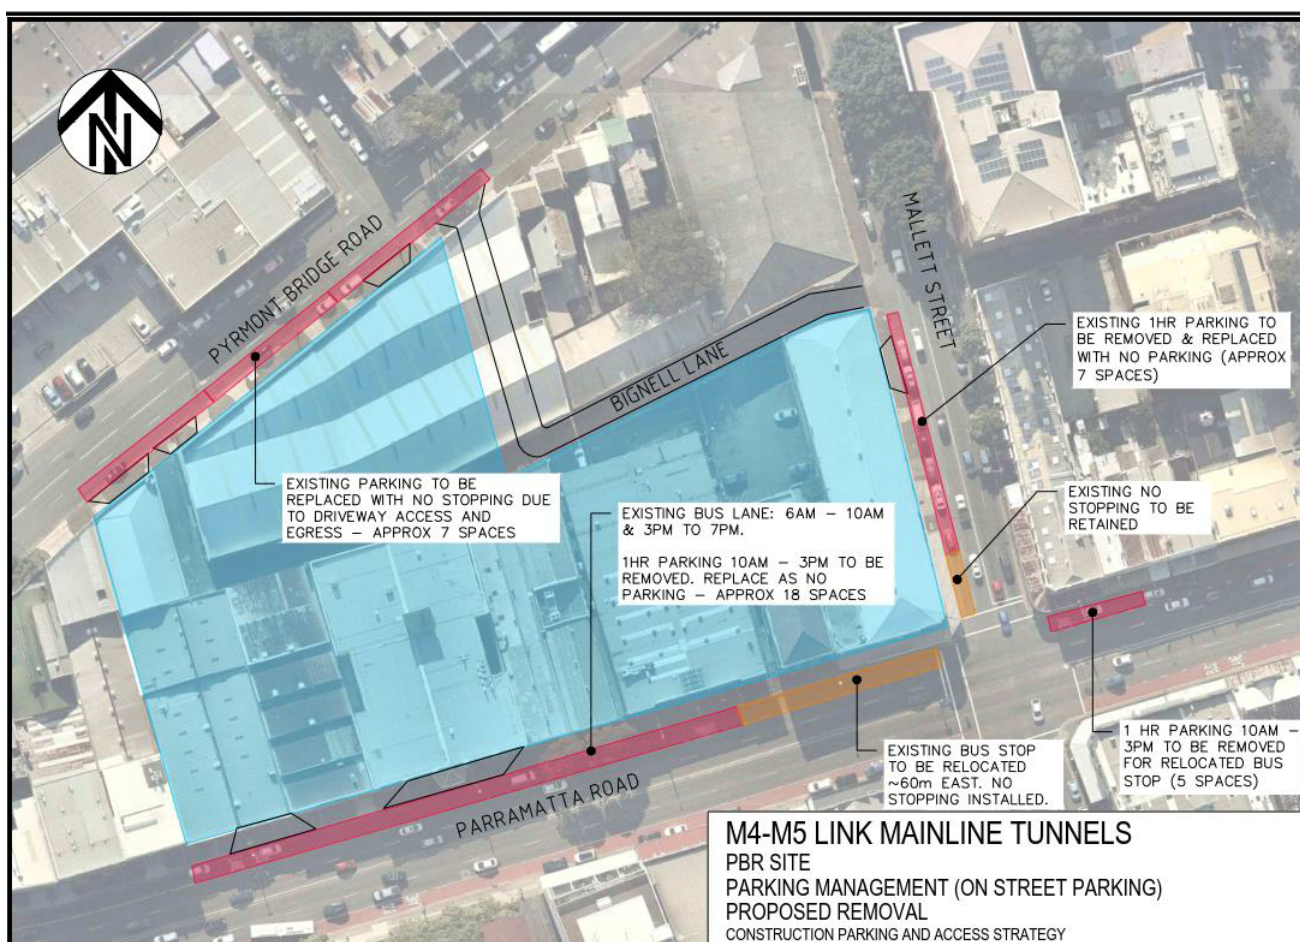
PBR On-street Parking Removal Areas - Pyrmont Bridge Road
